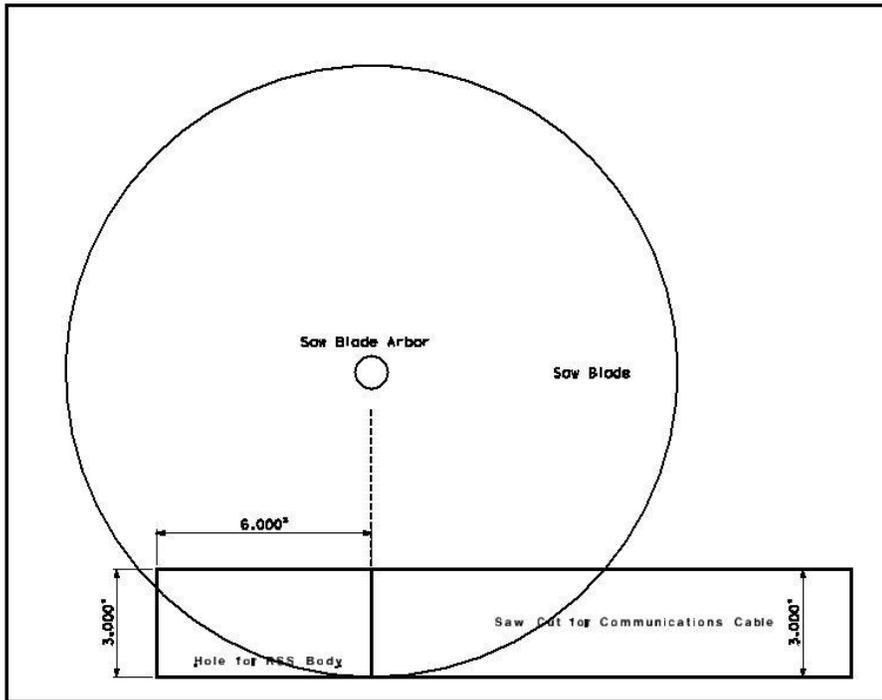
Sensor Lead-In Cable Saw Cut to RSS Hole
